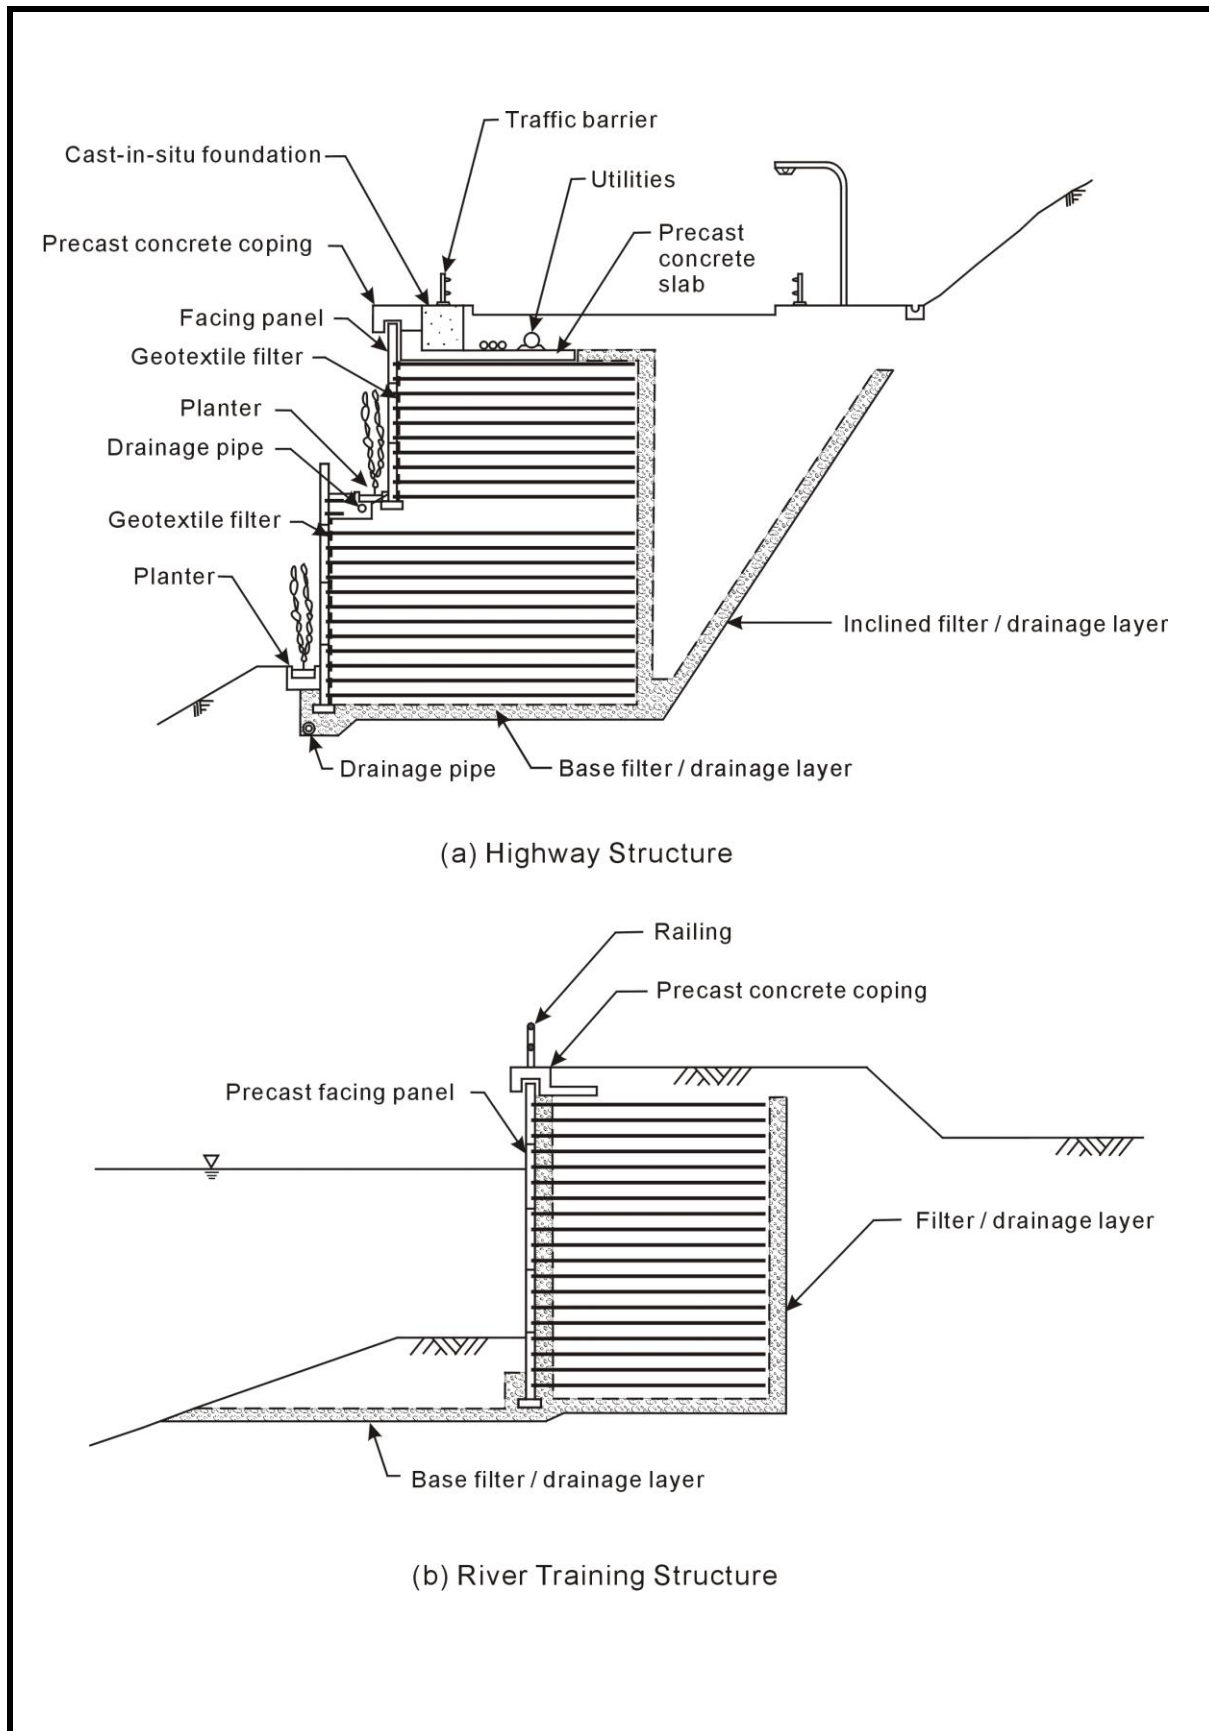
Typical Drainage Layouts for Highway and River Training Applications
